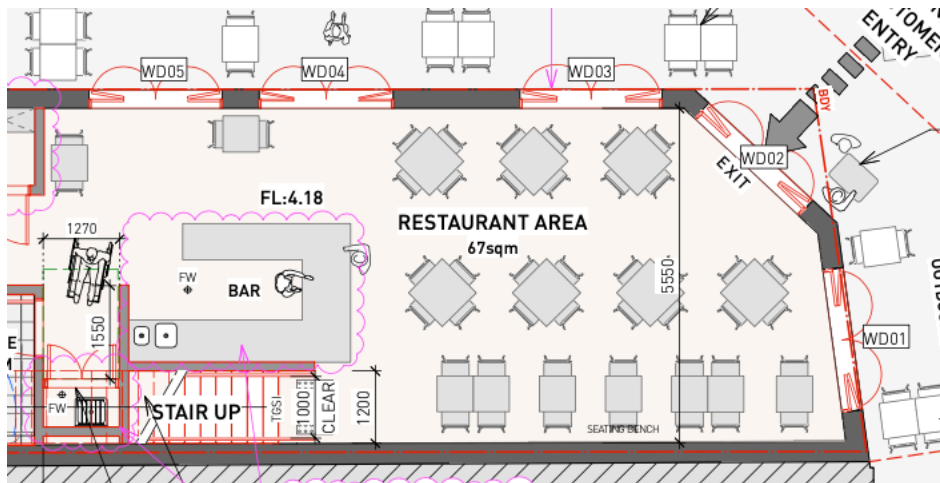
, Ground Floor: Existing double folding doors WD01-05 to be replaced, like for like, with new timber framed doors. Existing highlight windows above doors to remain, repair as required and paint.
